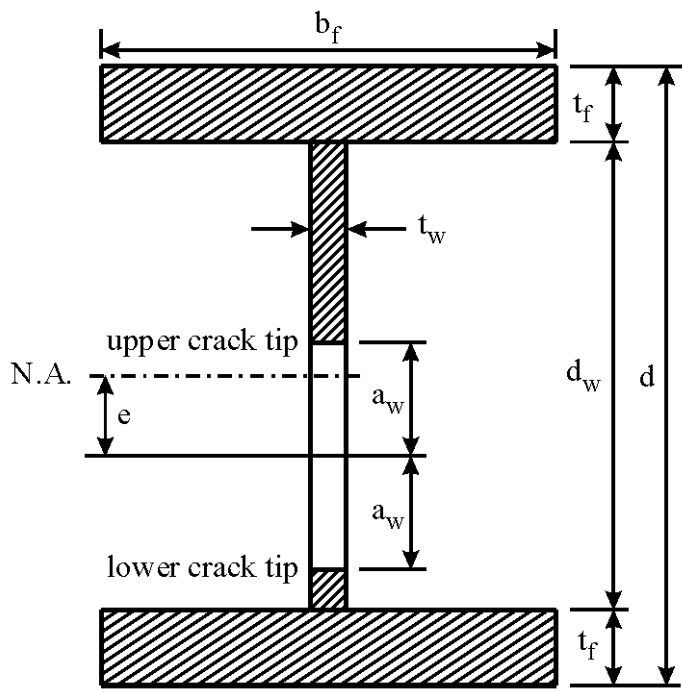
Through-Thickness Web Crack in an I-Girder
